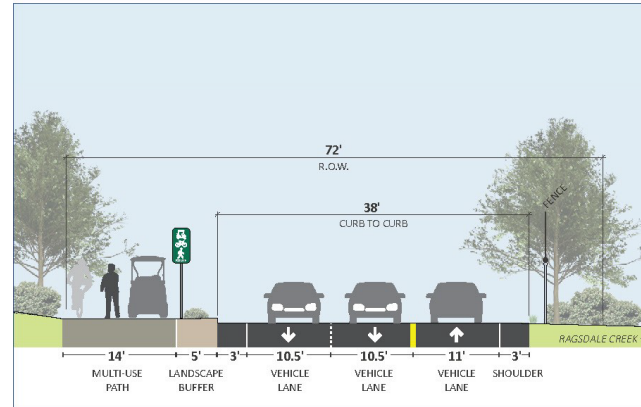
Proposed Street Section of Combie Road with New Multi-use Path (looking east)
